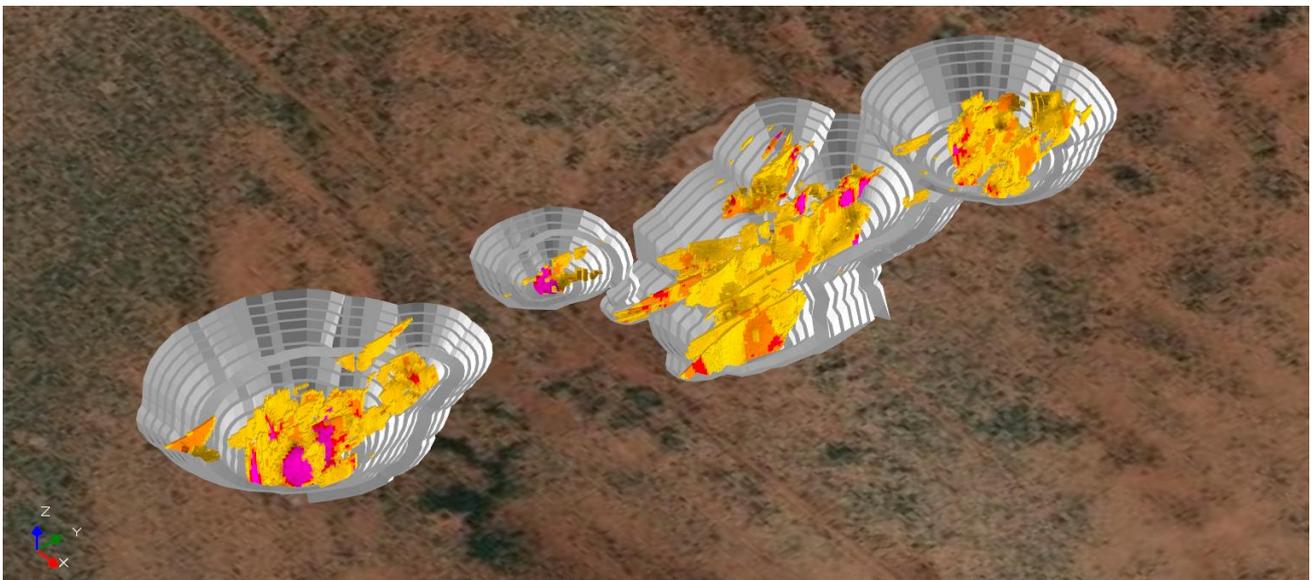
Isometric view showing Turnberry final pit design shell and dig blocks.
